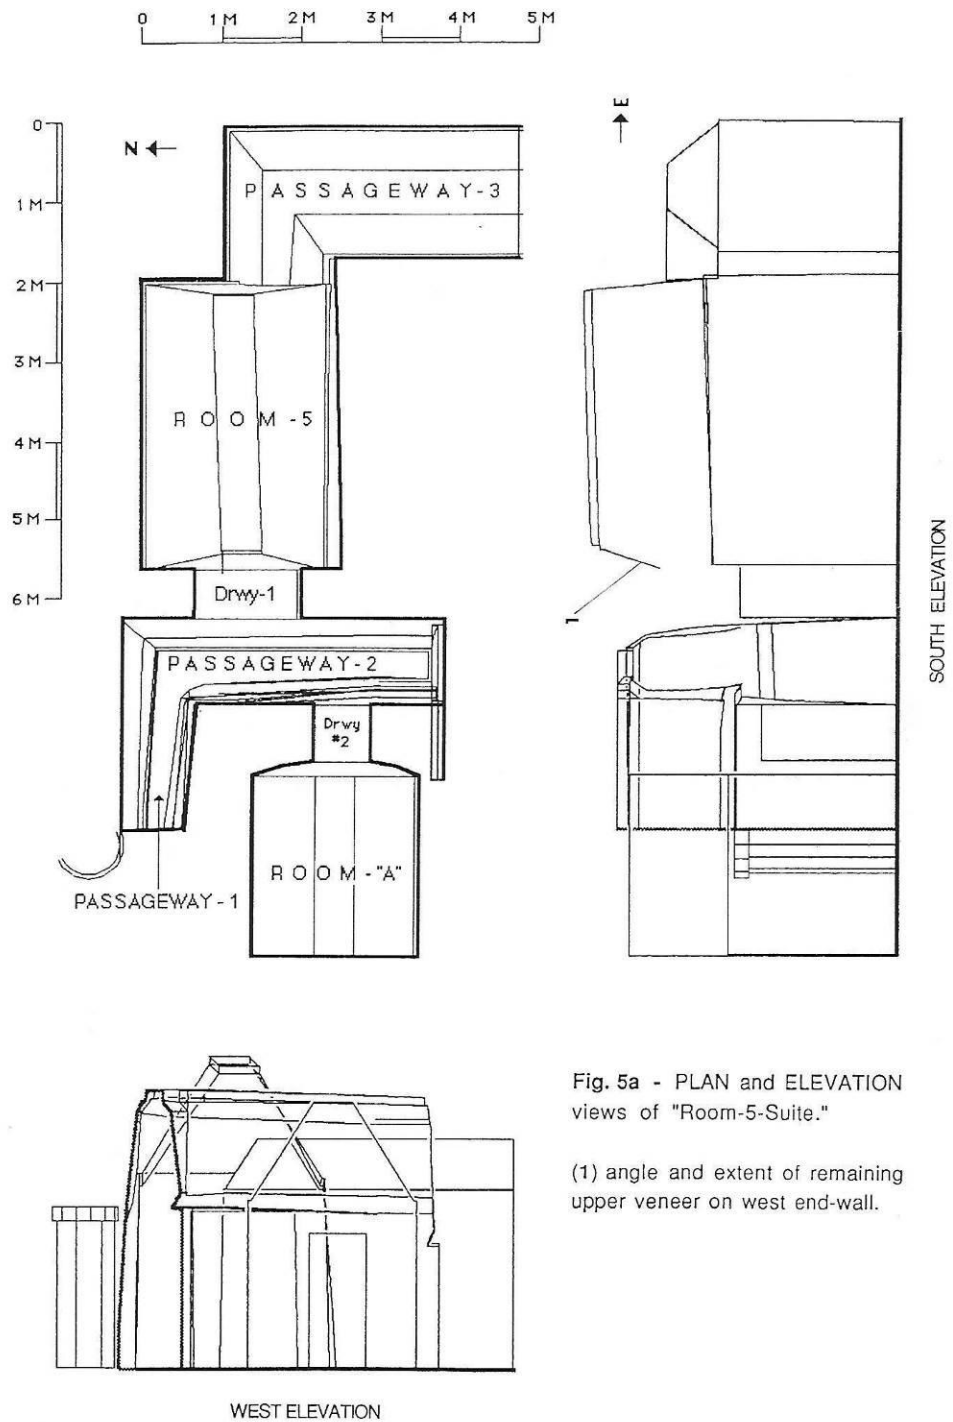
PLAN and ELEVATION views of "Room-5-Suite."
